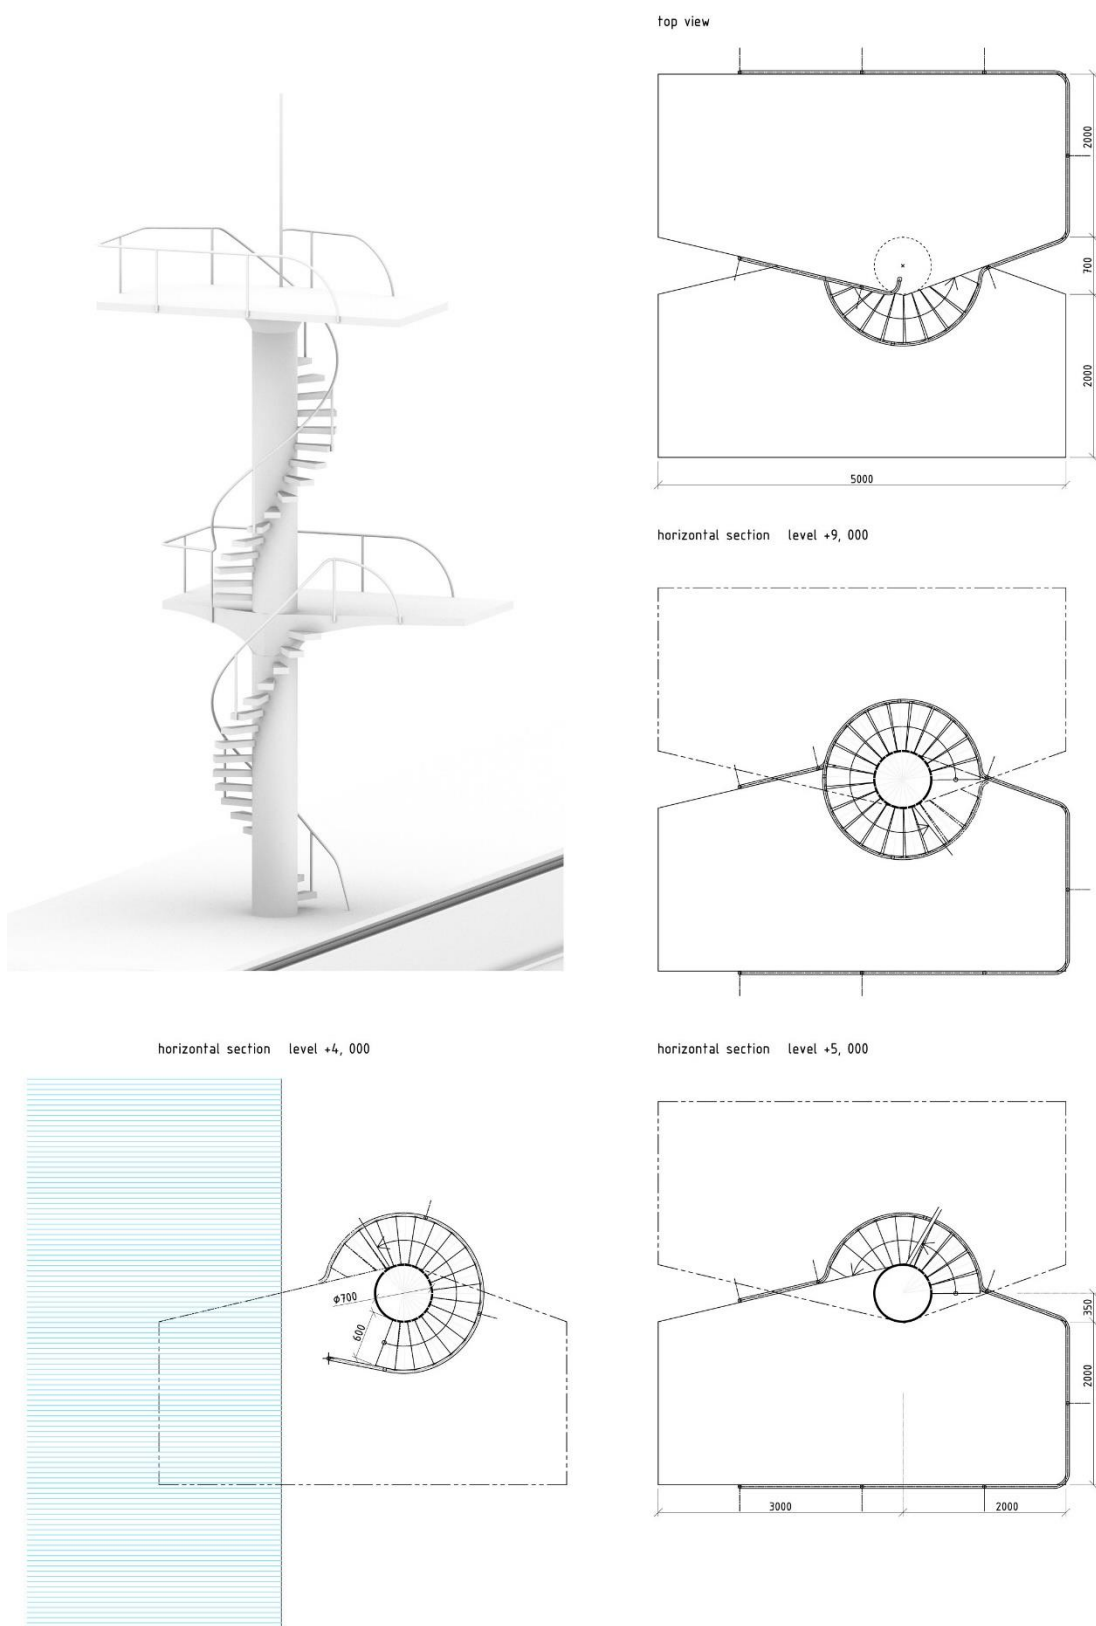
d) Reconstruction of the original state – horizontal sections, 3D sketch.
